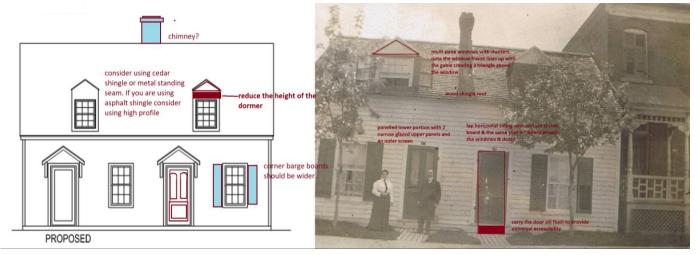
Reference photo of a house in Lowertown with similar characteristics to 115 Dalhousie Street. The notes are provided to suggest possible finishes that will be appropriate to 113-115. Source: Archives Canada with Commonwealth notes.
